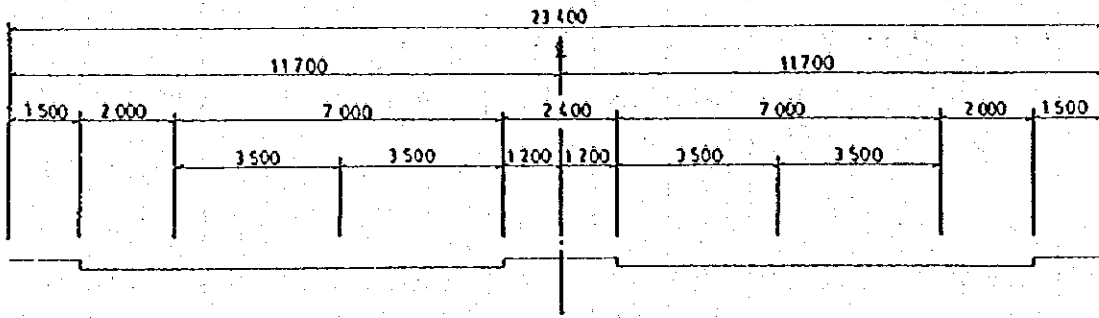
GENERAL ARRANGEMENT PLAN OF MOTORWAY AND
